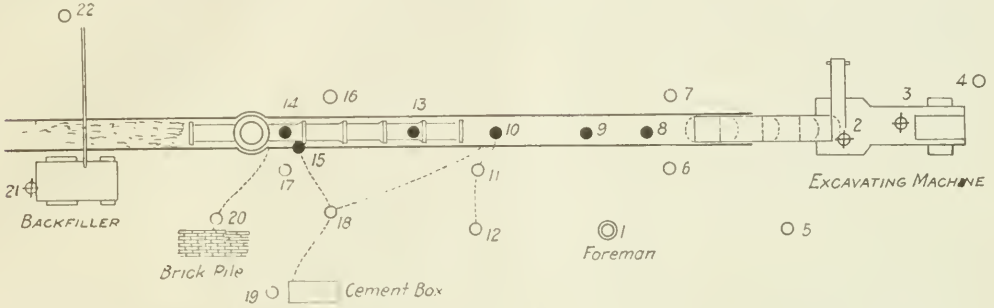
CHICAGO ORGANIZATION FOR CONSTRUCTING SMALL SEWERS WITH POWER EXCAVATORS AND BACKFILLERS.
